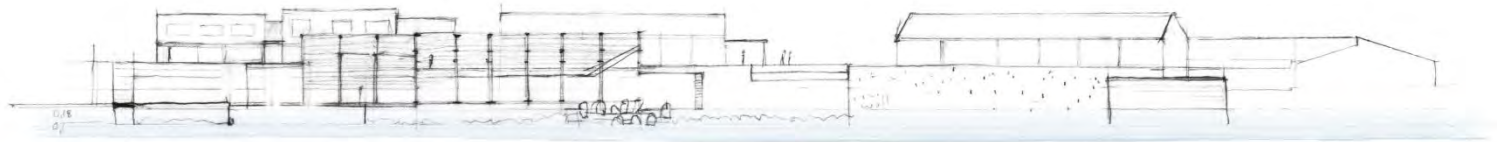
A broken up façade for the restaurant (back) was tested in the beginning (Author, 2013)
